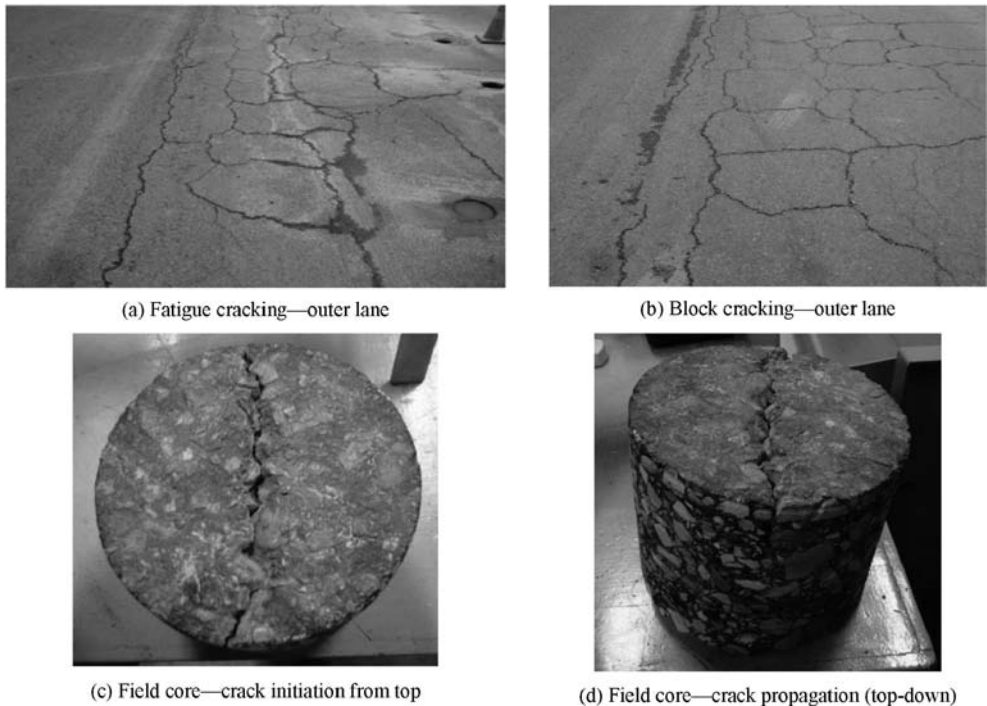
Pavement surface conditions and crack propagation at site N5S-4 (Mandra section).
